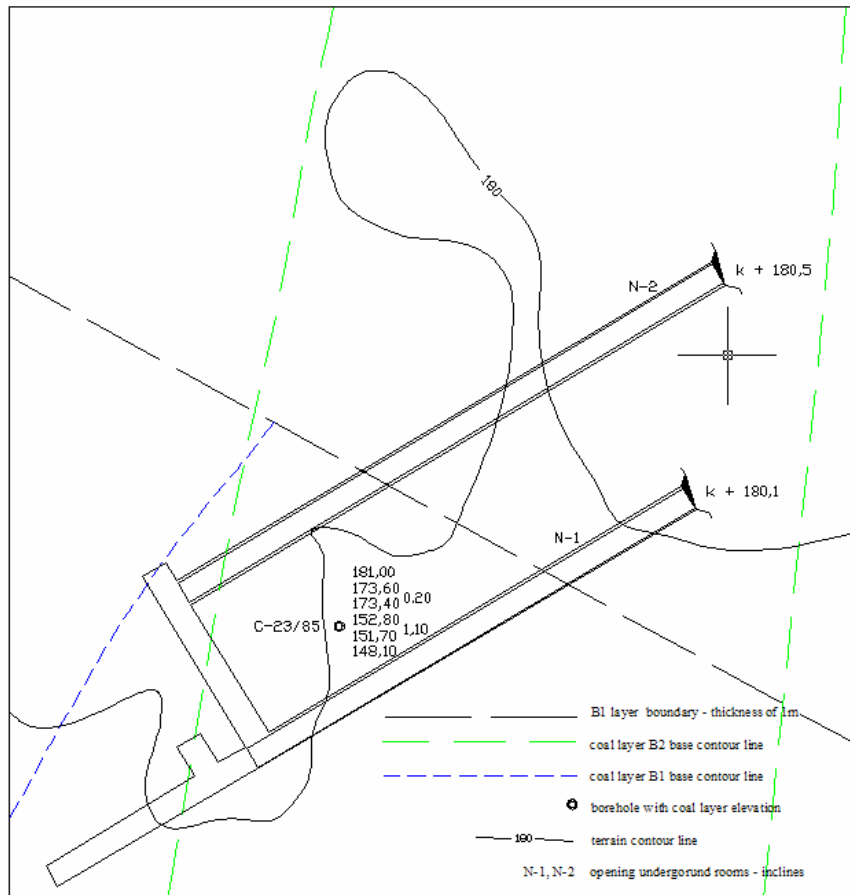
Opening underground rooms - inclines N-1 and N-2
